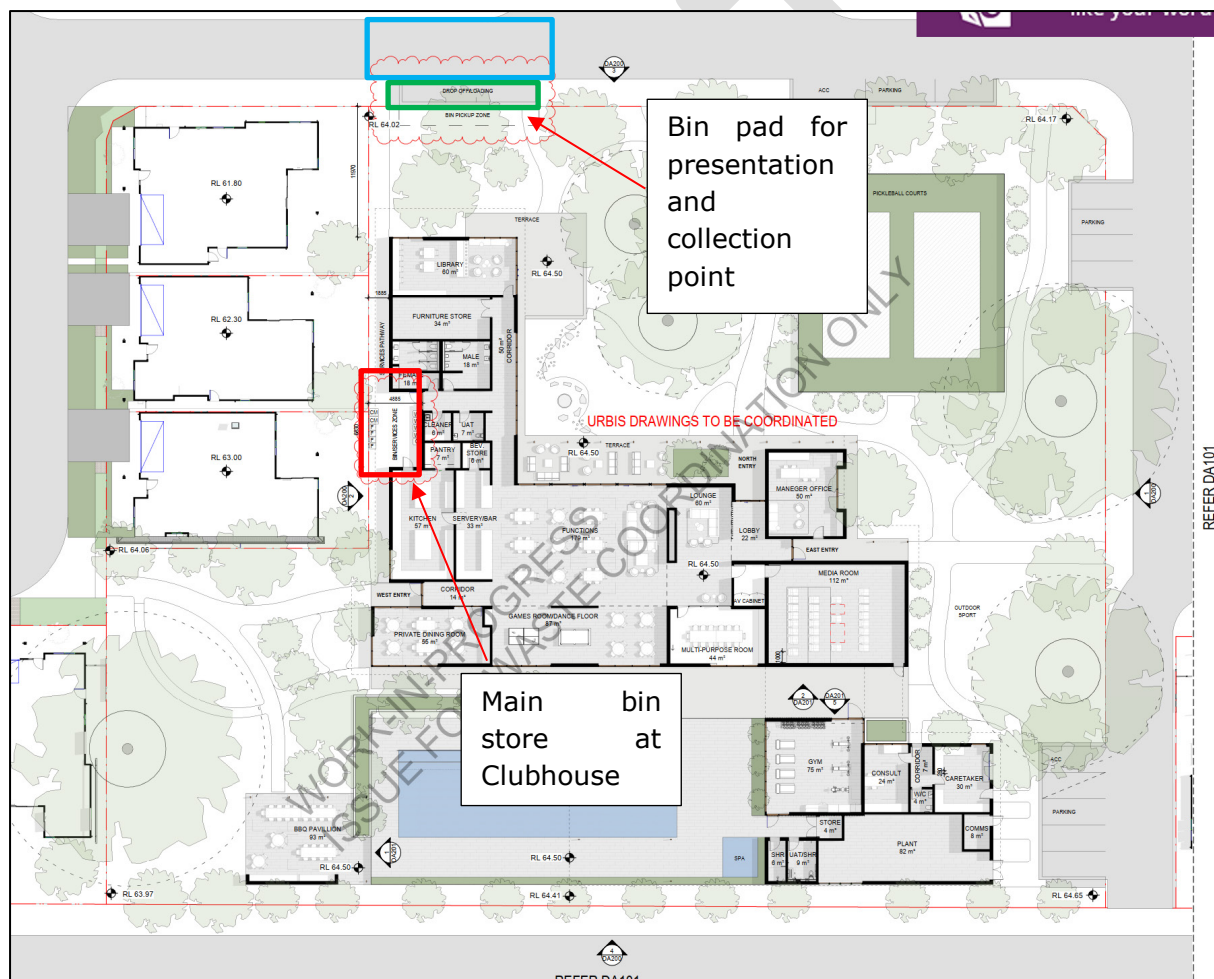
Ground floor plan showing the main Clubhouse bin store and collection point
